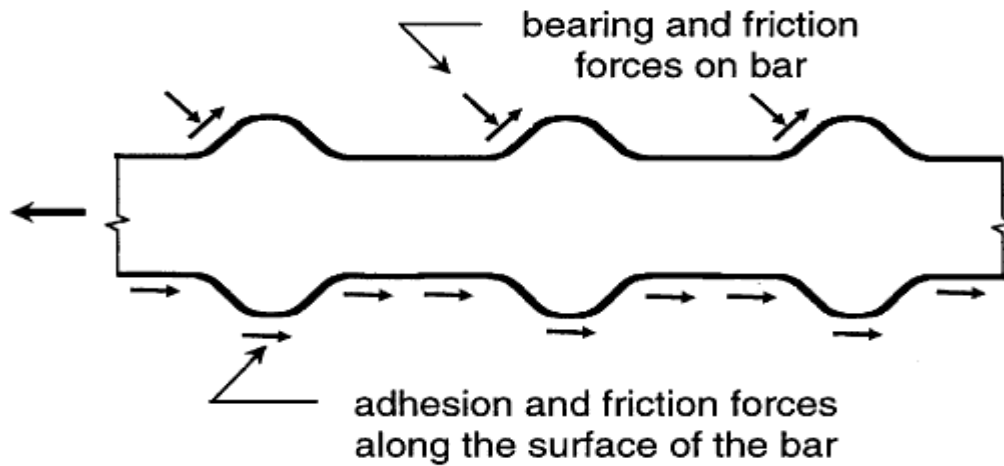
Bond mechanism of deformed reinforcement in concrete due to adhesion, bearing and friction (ACI 408R, 2003)
